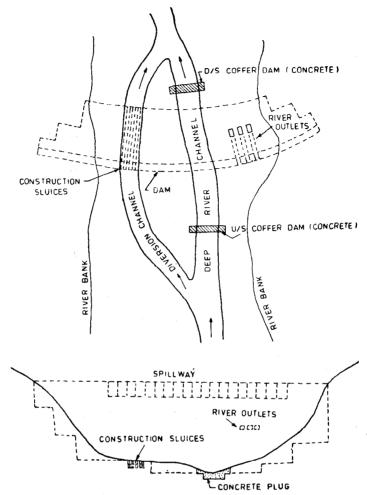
Diversion Channel for Concrete/Masonry Dam in a Wide River
